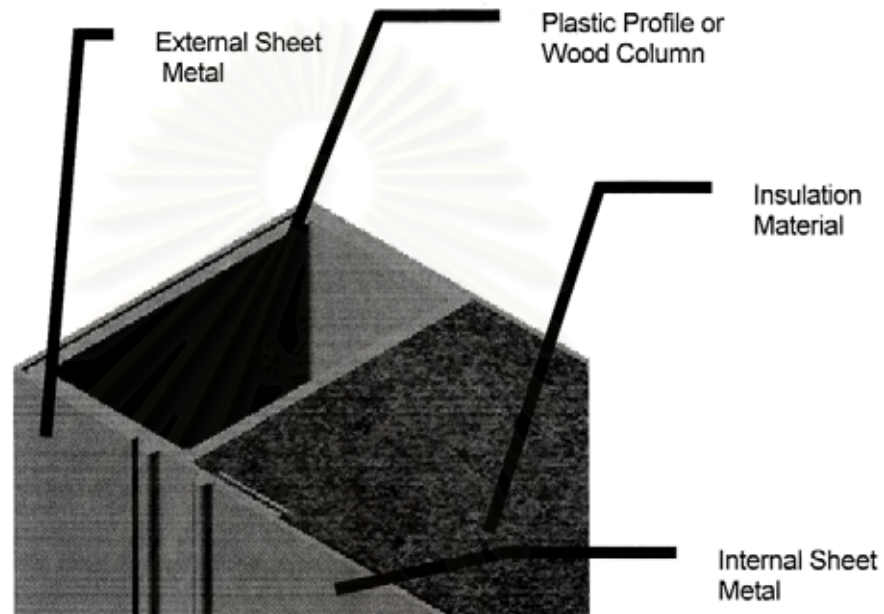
Concept 4 Wall Panel and Floor Panel Design
